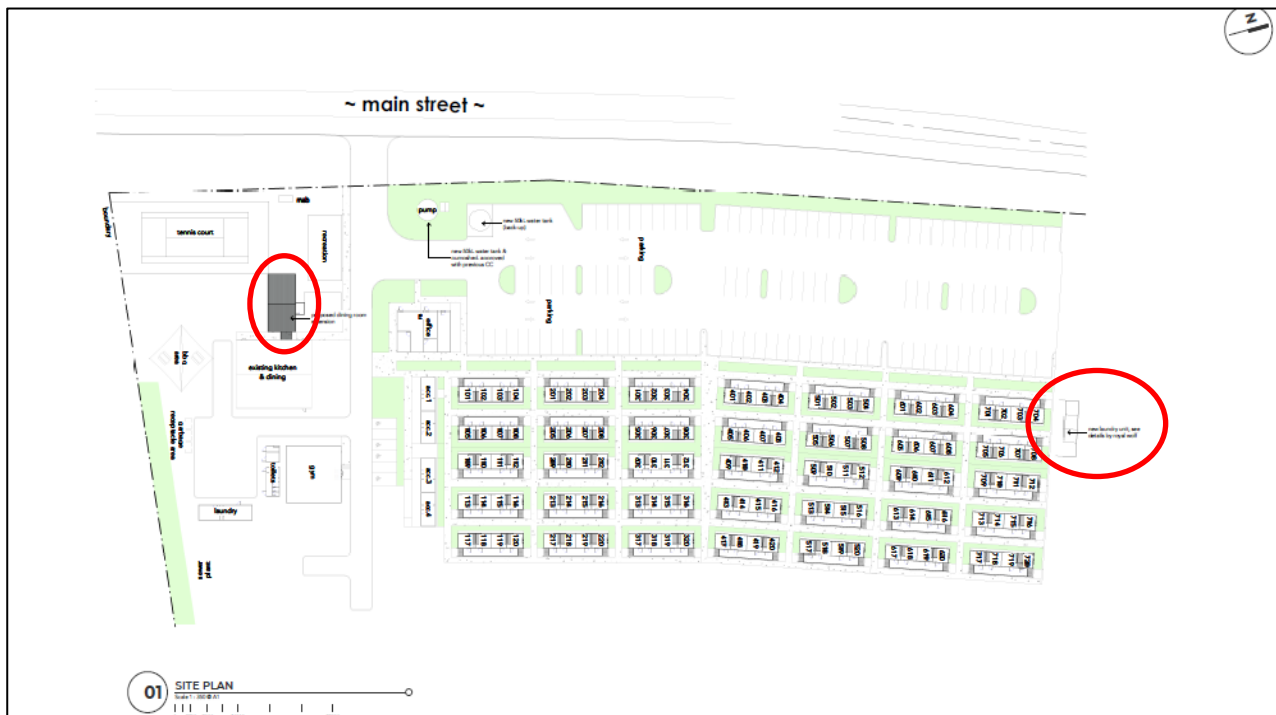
Proposed Site Plan (additional buildings highlighted in red)
